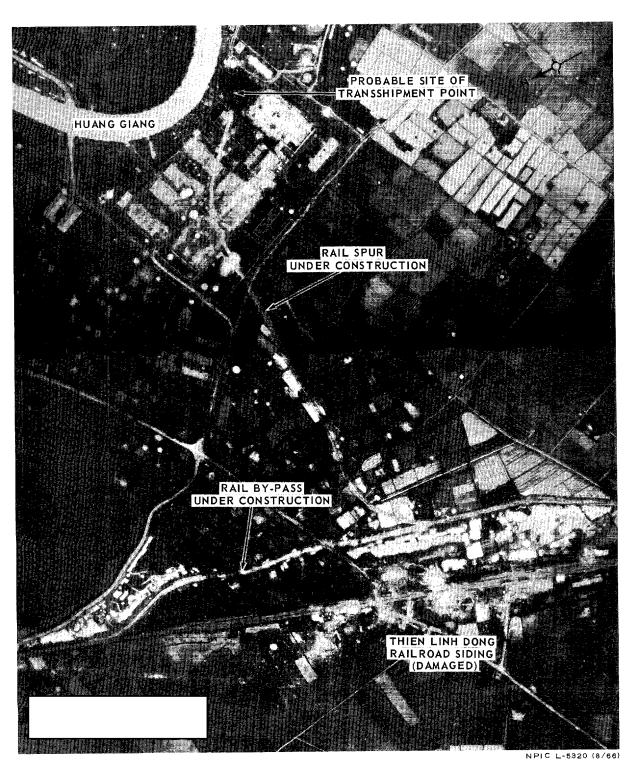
RAILROAD CONSTRUCTION, THANH HOA/VINH RAIL LINE, NORTH VIETNAM
